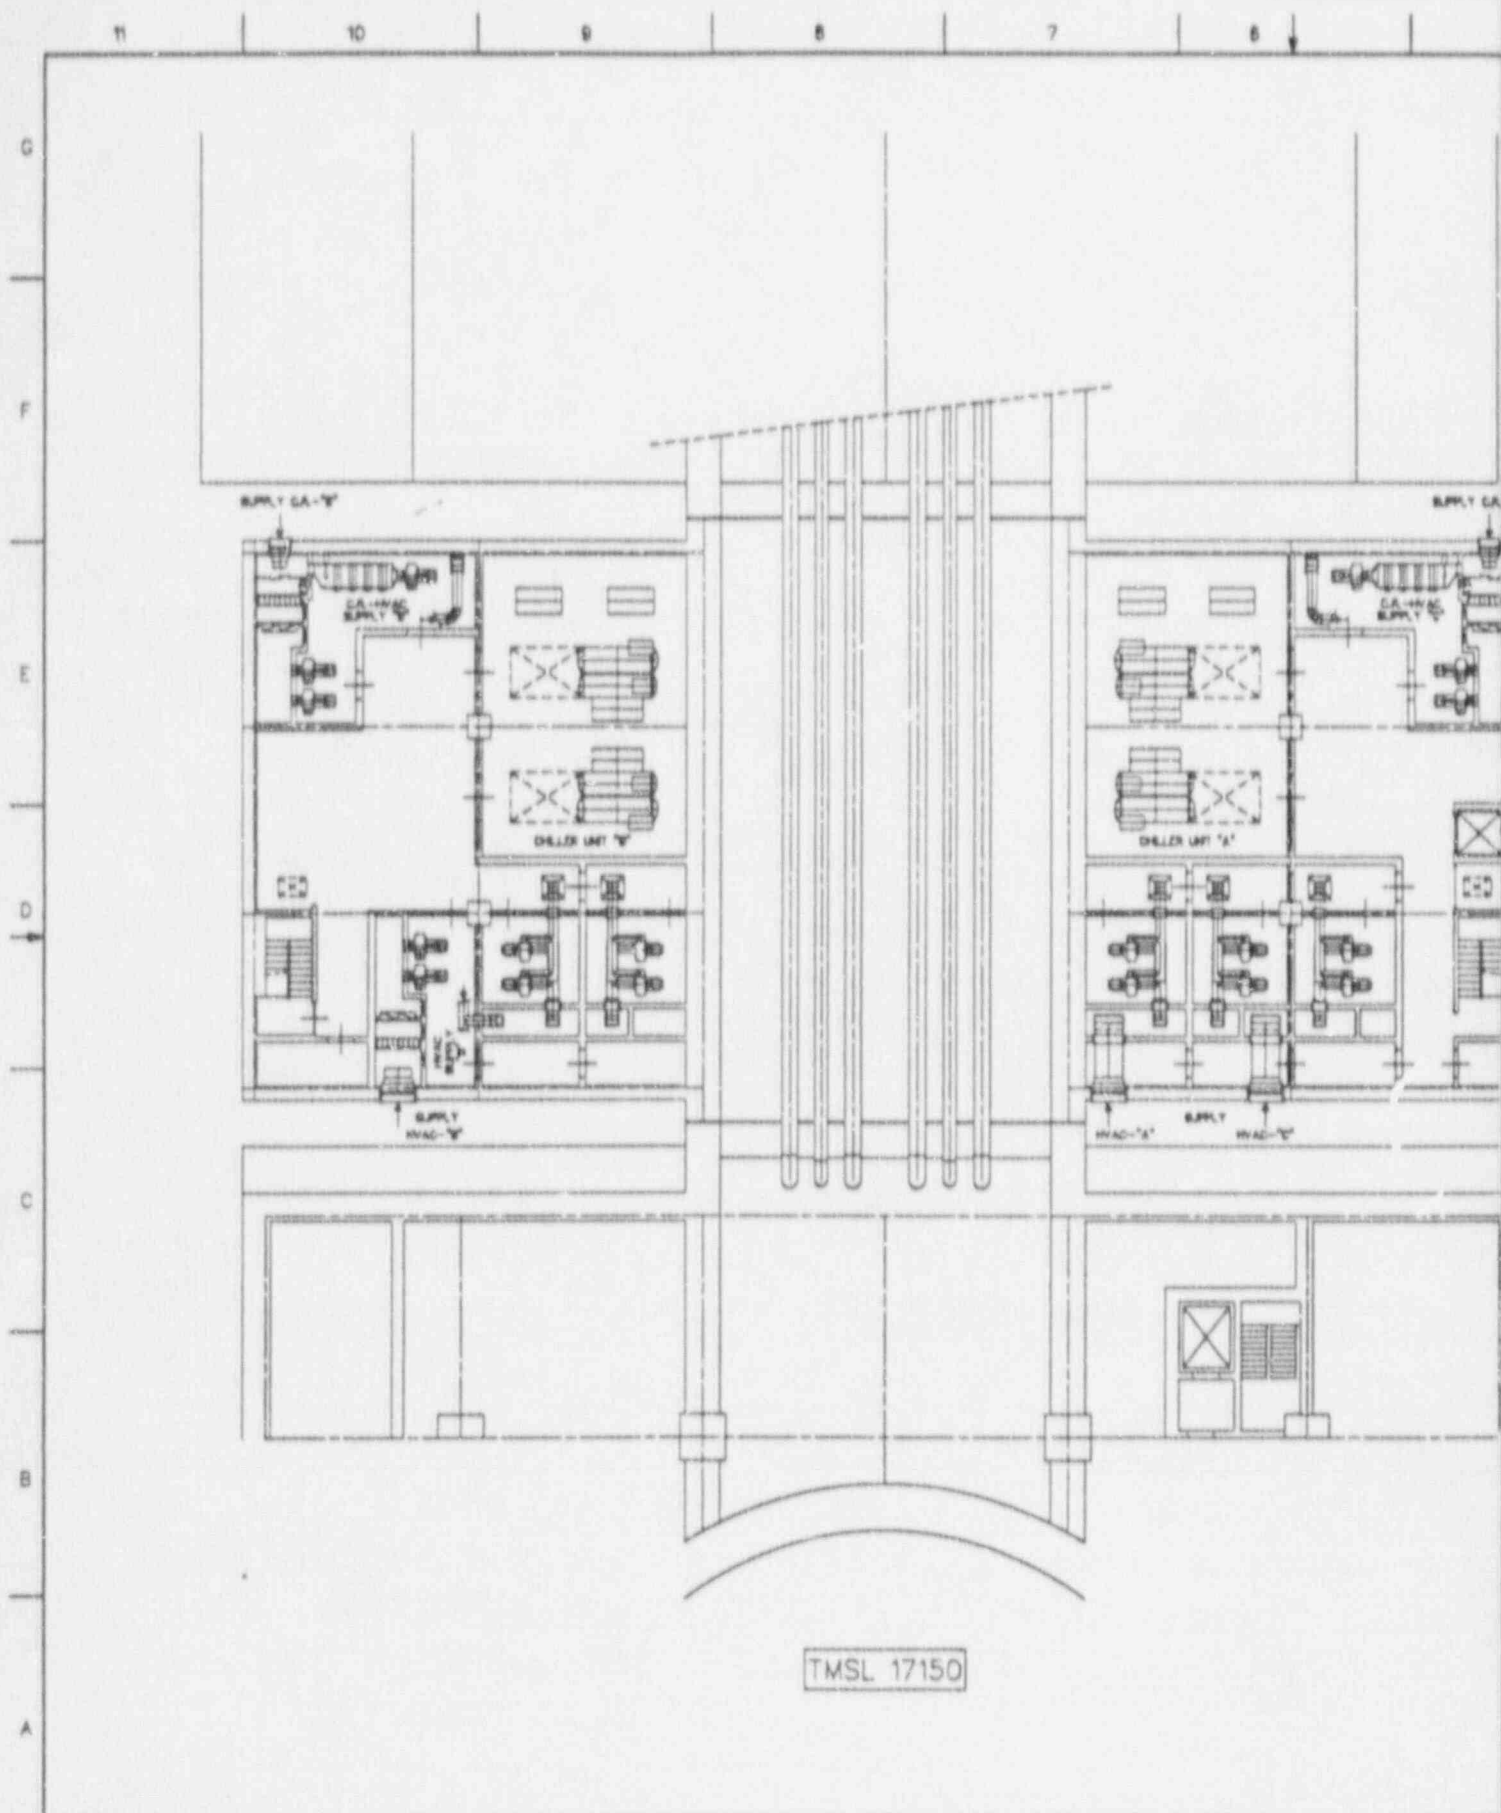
CONTROL AND SERVICE BUILDING, ARRANGEMENT
